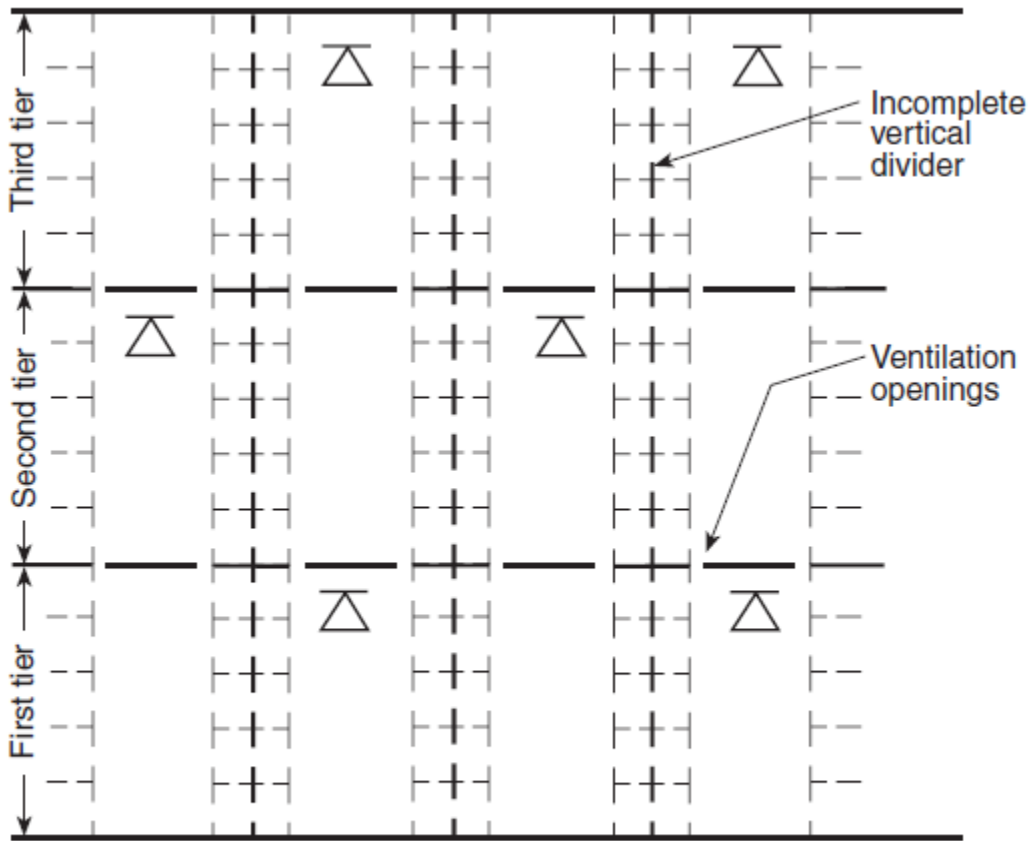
(b) Sprinklers in Multitier Bookstacks with Incomplete Vertical Dividers.
